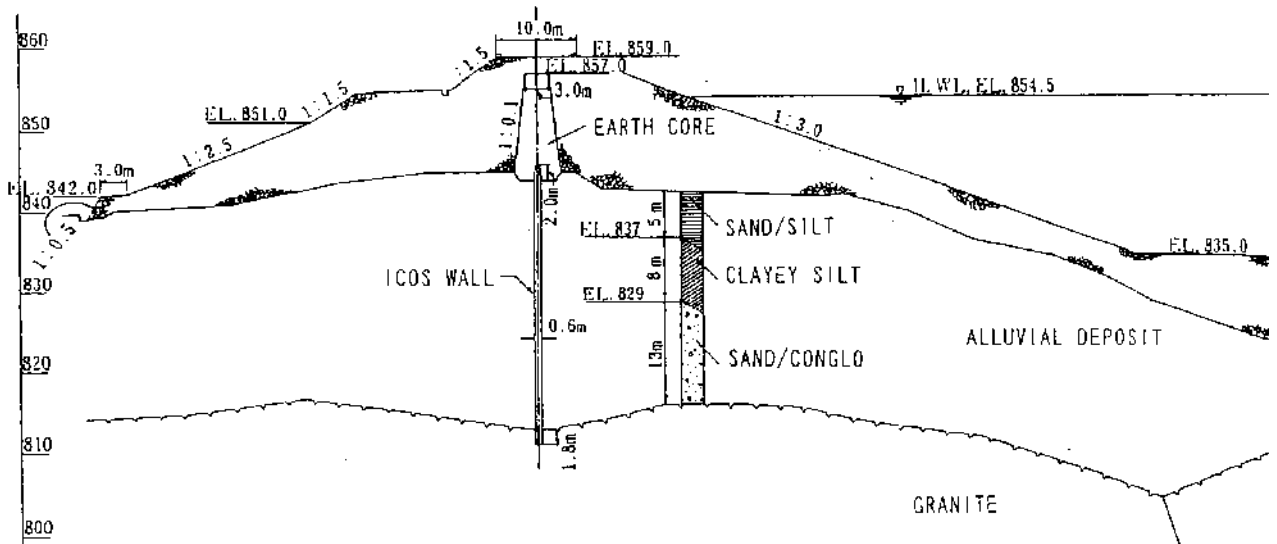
Cross section of Yagisawa wing embankment dam with ICOS type pile wall
